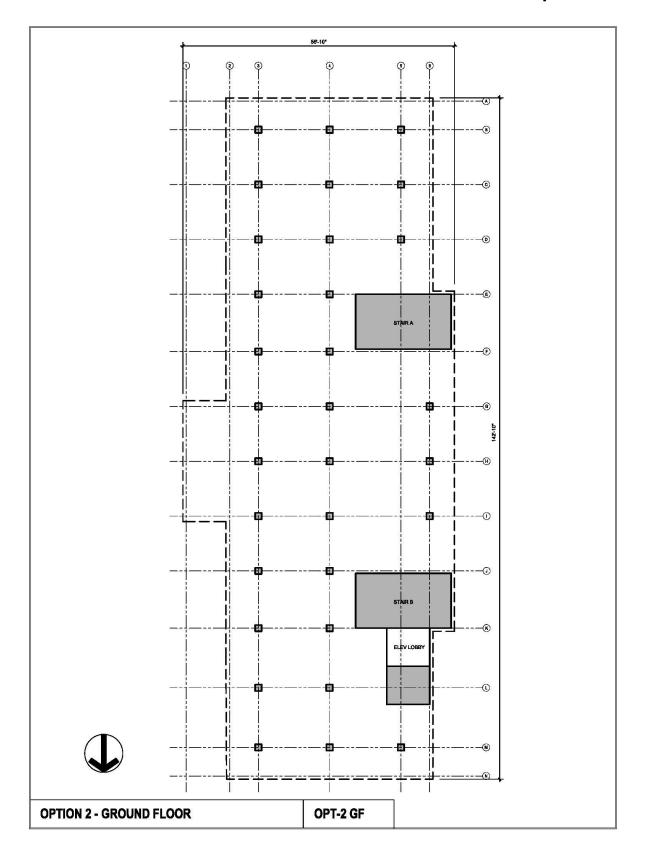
Pre-Design Building Option 2 - Ground Floor
